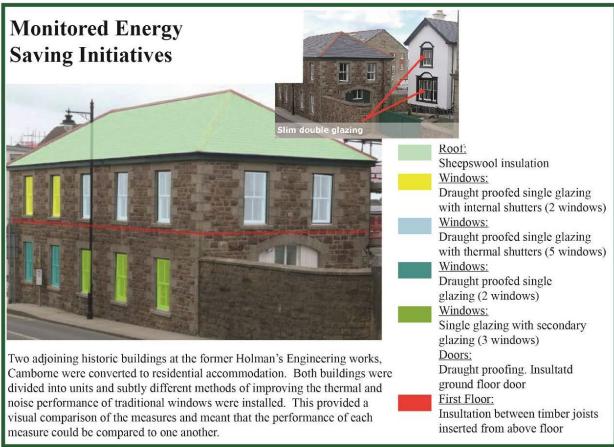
Example from 'Improving Energy Efficiency in Cornish Historic Buildings' guide, showing how timber single glazed sash windows can be upgraded without altering their character by installing draughtproofing, secondary glazing, internal timber shutters and slim double glazing. Monitoring showed that all of these methods effectively reduced heat loss, reducing energy bills by 15% and £100 a year for occupants as well as providing good noise protection. The building was not listed and without grant aid unsympathetic pvc windows could have been installed which would have damaged character.
